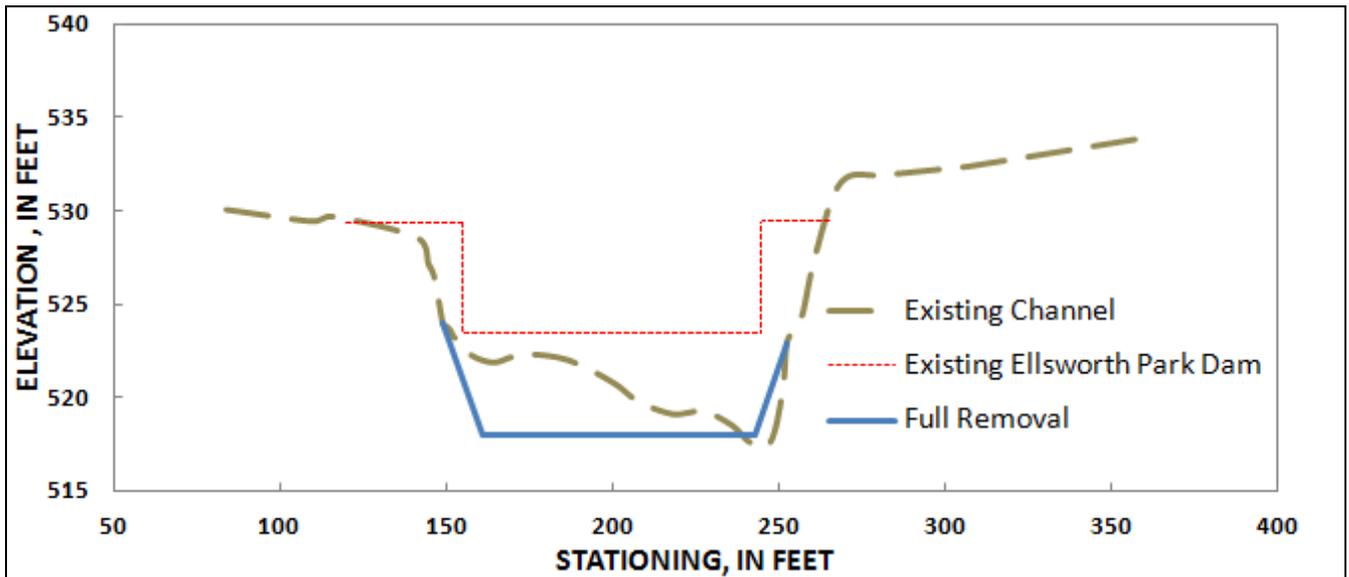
Ellsworth Park Dam Full Removal Cross Section
